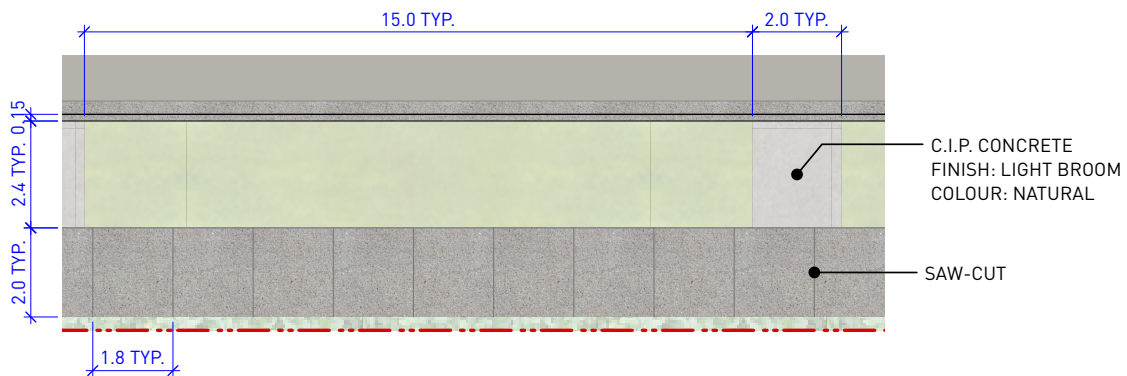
ENLARGEMENT 5 - PAVING AROUND PLANTER
